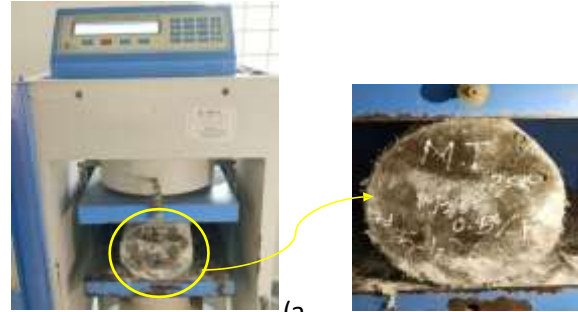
Testing of specimen (a), Specimen (cube) under loading (b)
